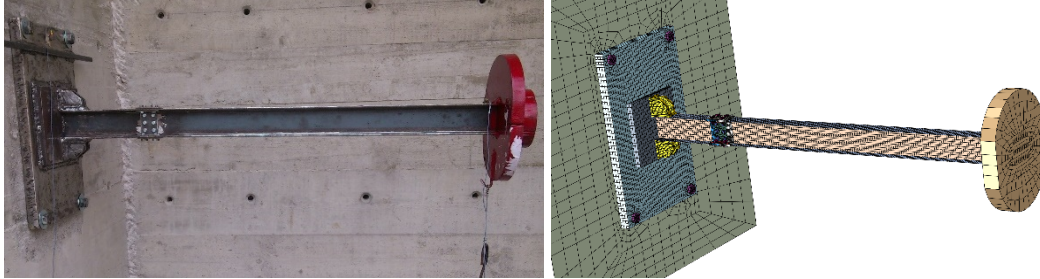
Model of experimental and numerical cantilever beam with bolted splice connection joint
